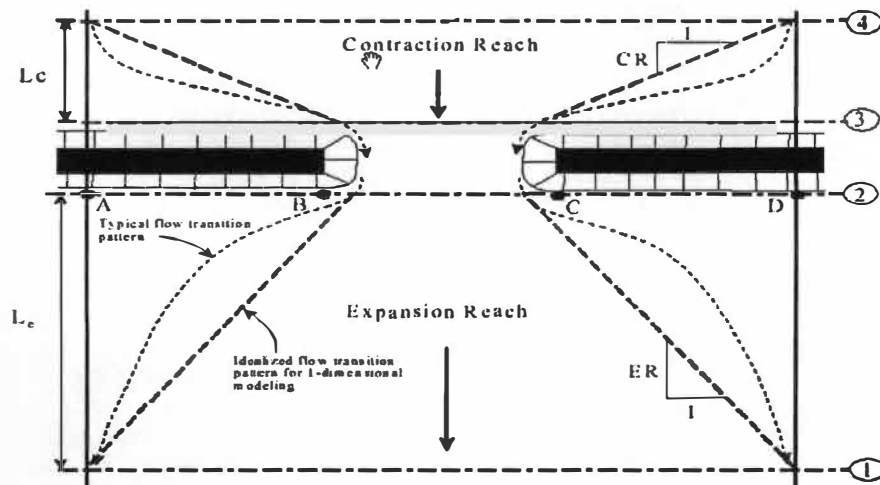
Bridge Reach Cross-Sections (HEC, 1997)
